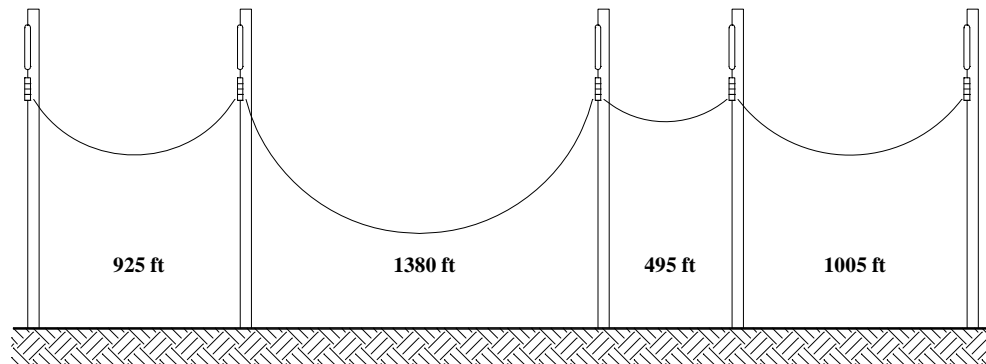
LINE SECTION FOR EXAMPLE 9-1
